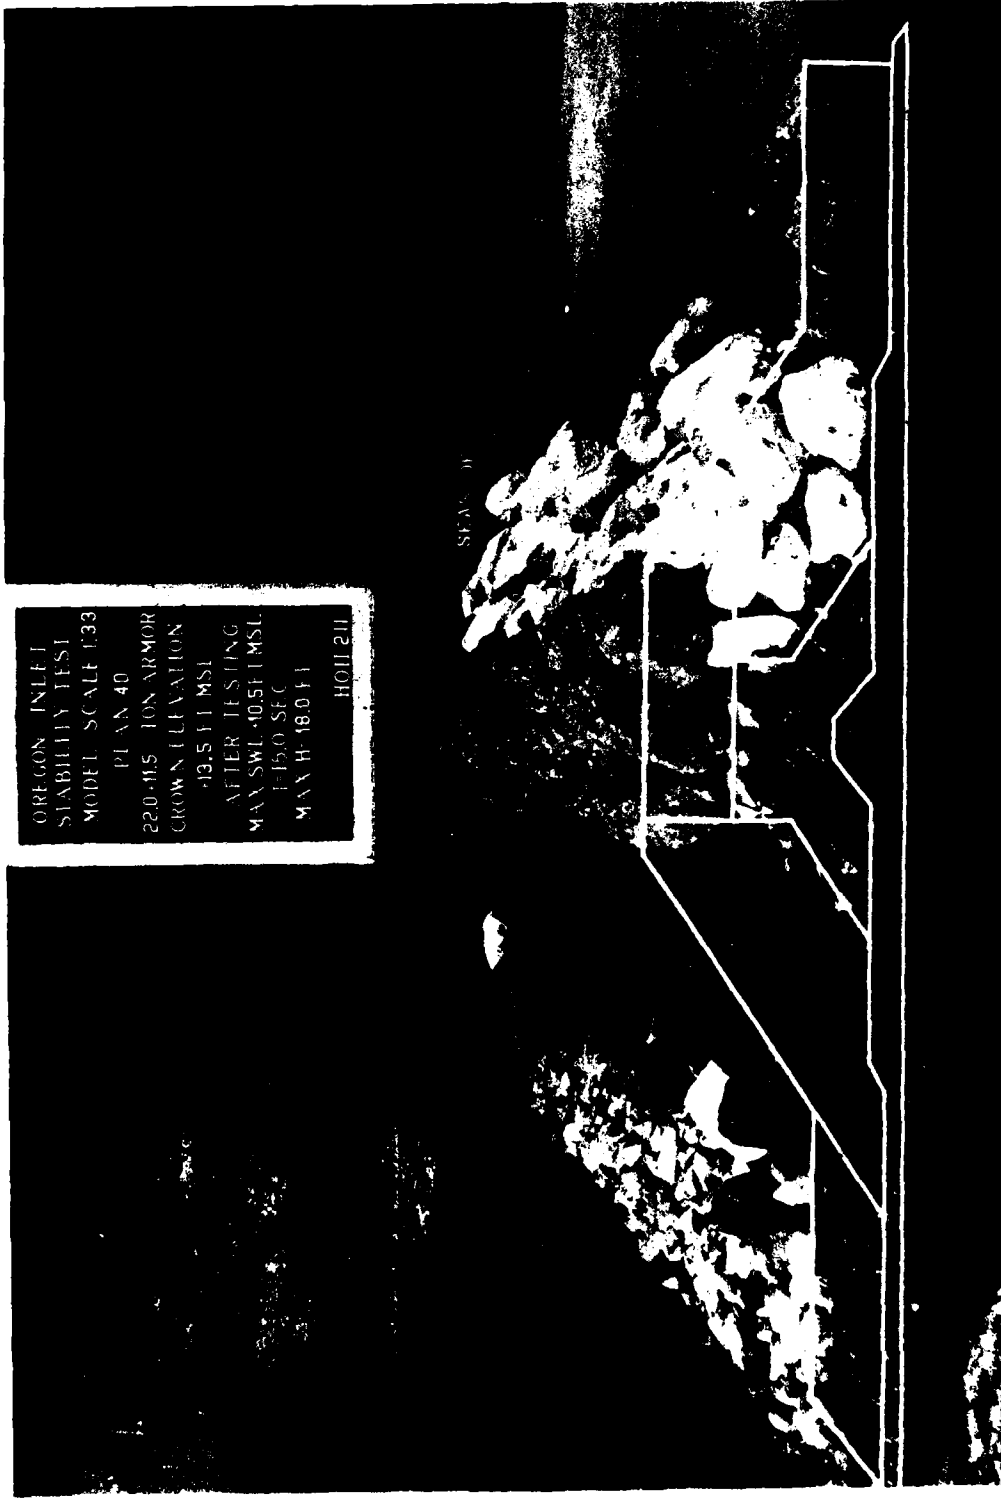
End view of Plan 4D after testing step 7 of the +10.5 ft NGVD hydrograph
